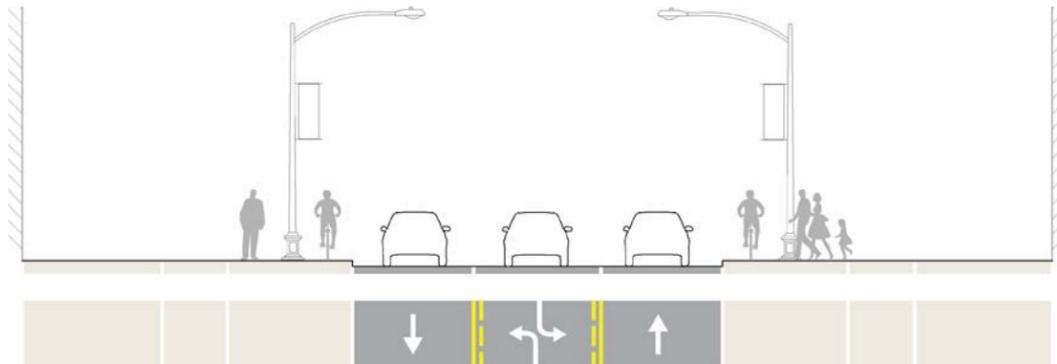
Martin Luther King Jr Boulevard typical section from North Lamar Boulevard to Rio Grande Street
